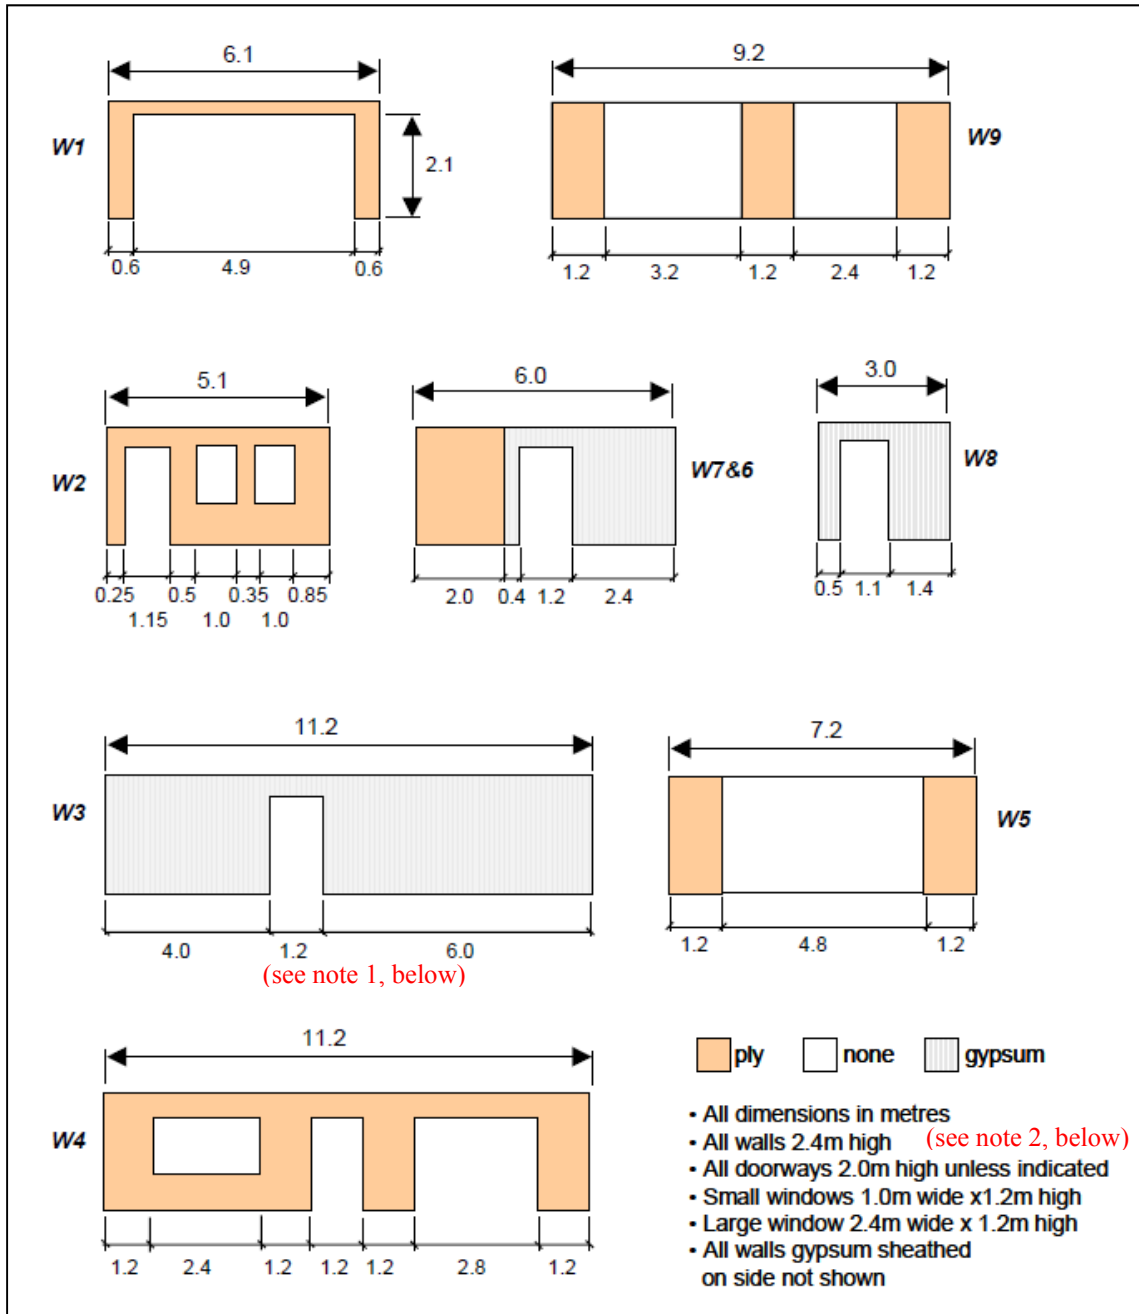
Wall Configurations (Paevere 2002) – Note: (1) The doorway in W3 was relocated as shown in Figure G-5 based on the point of intersection between W6 and W3.
